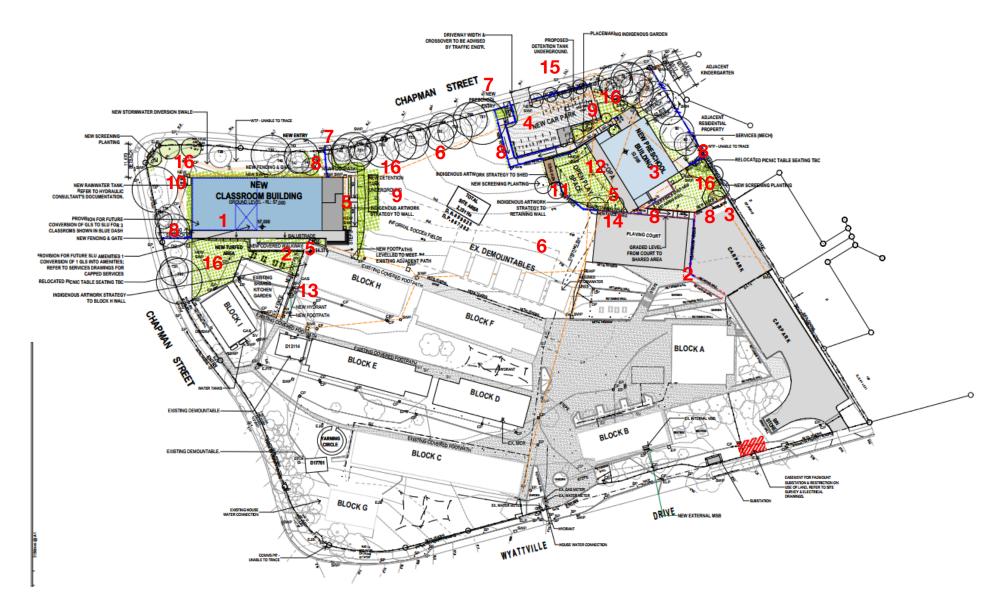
Proposed Scope of Works (Fulton Trotter Architects, Proposed Site Plan, Rev 12 – note to scale).
